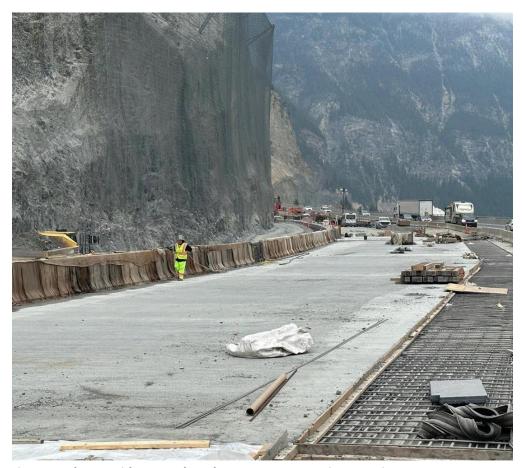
Sheep Bridge – Deck and parapet construction ongoing – August 31, 2023
